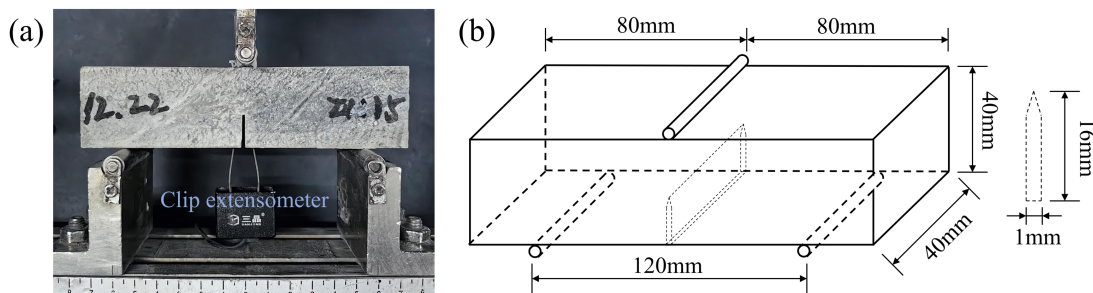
Fracture toughness test: (a) the device and (b) the specimen size.
